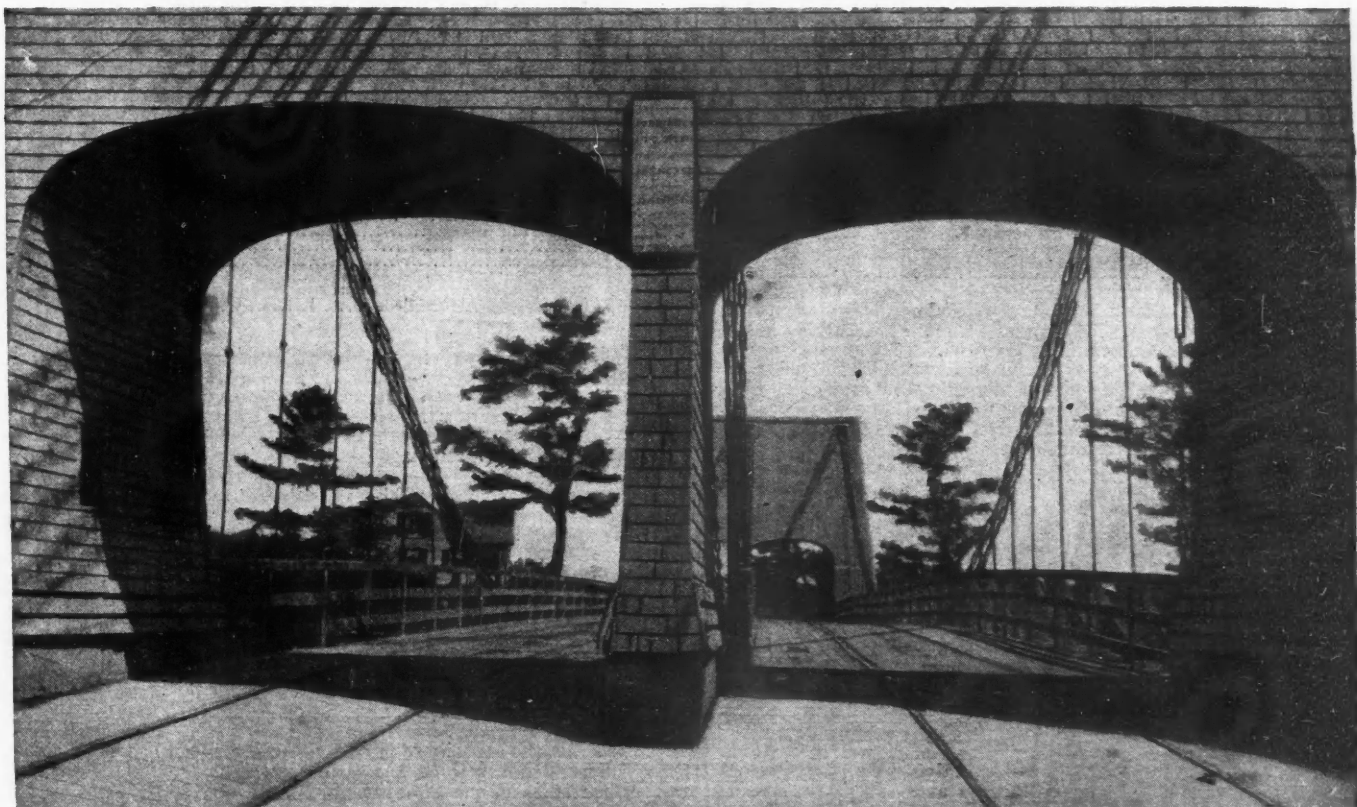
PLATE III.—ESSEX-MERRIMACK BRIDGE. 1810.
